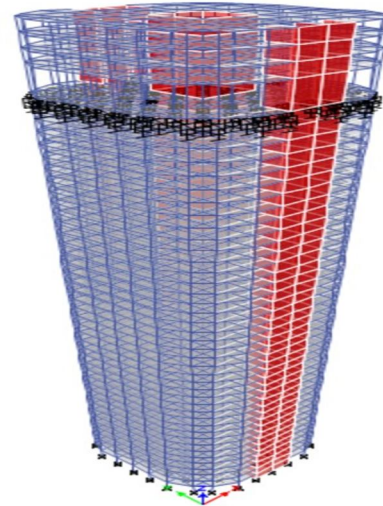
Soft Storey at 42nd floor (storey 42) with LRB
